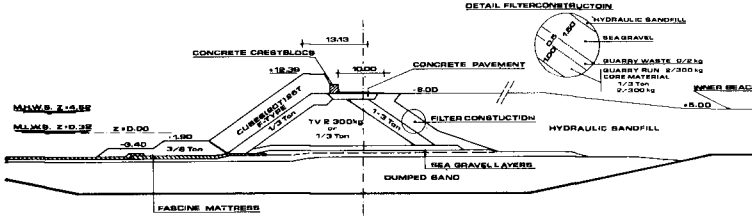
Typical cross-section - Design alternative at harbour mouth (Chainagepoints P1795 - P2150)
